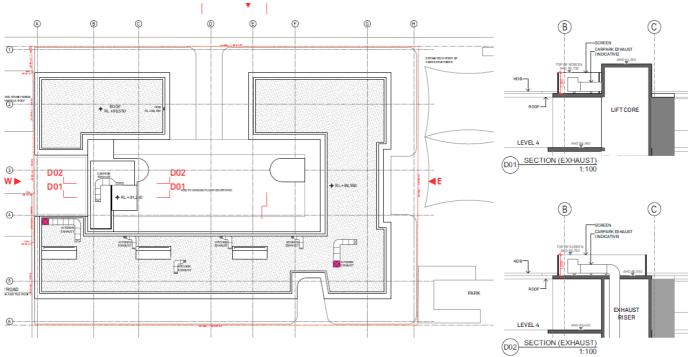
Roof Plan - Location of mechanical exhaust ducting in pink and typical section
